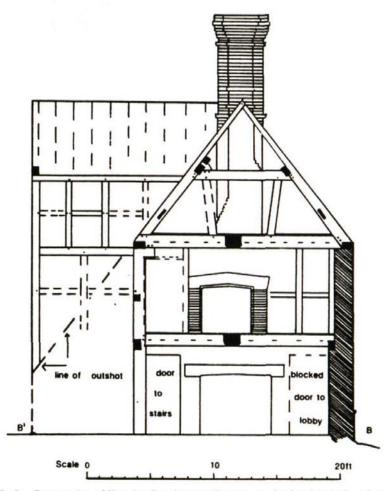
Cross section of Hensting Farmhouse. (All names on the drawing are based on structural and not documentary evidence.)
